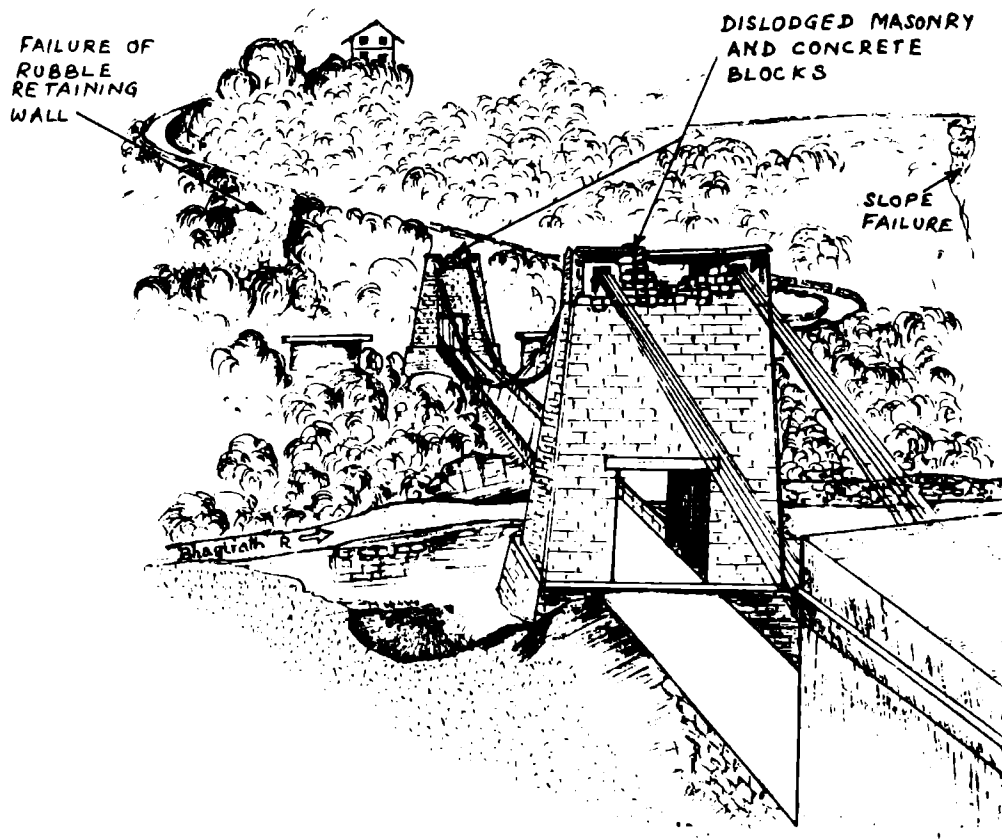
SKETCH OF LATA SUSPENSION BRIDGE SHOWING DAMAGES TO THE ABUTMENT TOWERS (SKETCH BY P. PANDE)
